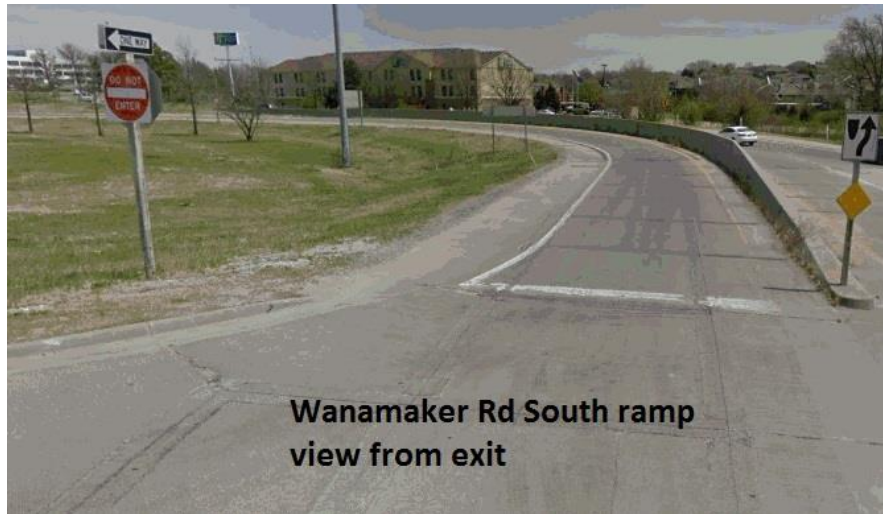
View of the Wanamaker Road South Ramp from the Exit
